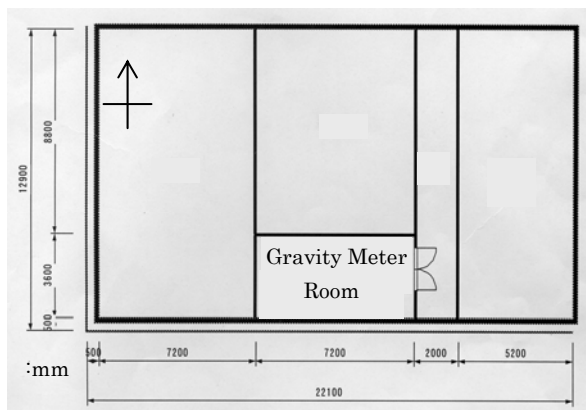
The plan view of the gravity meter room and its surrounding rooms.
